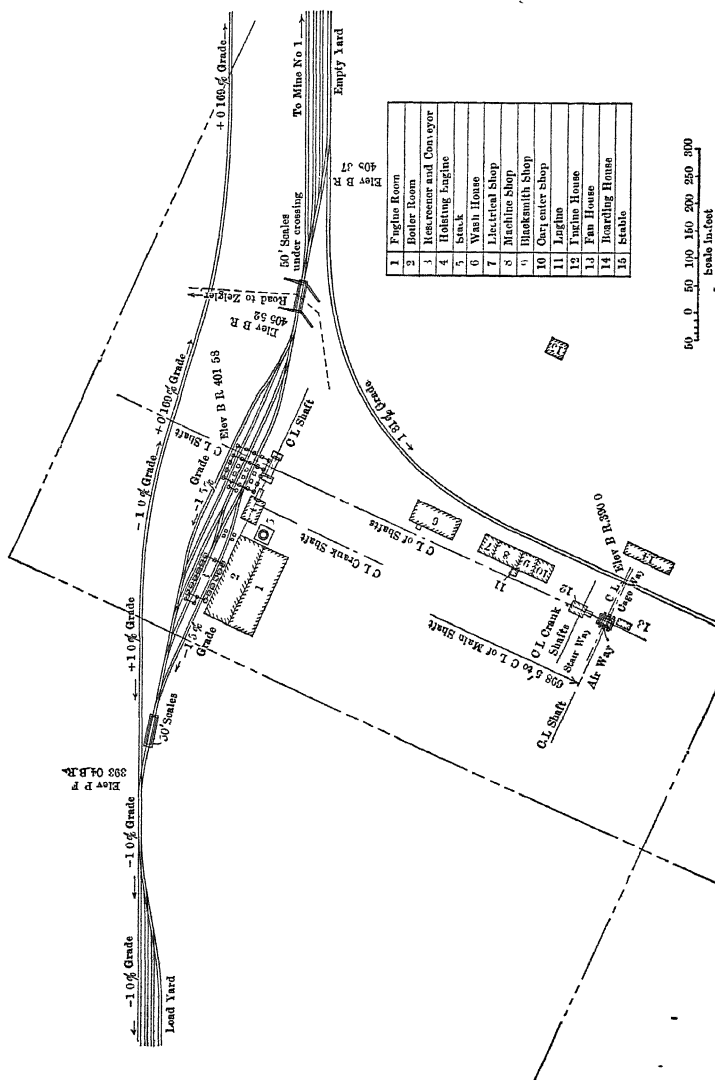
SURFACE LAYOUT, BELL & ZOLLER NO. 2 MINE.
